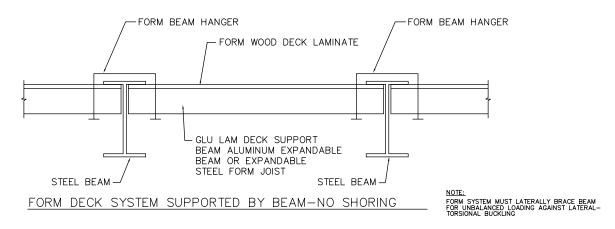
Form Deck System Supported by Beam—No Shoring
